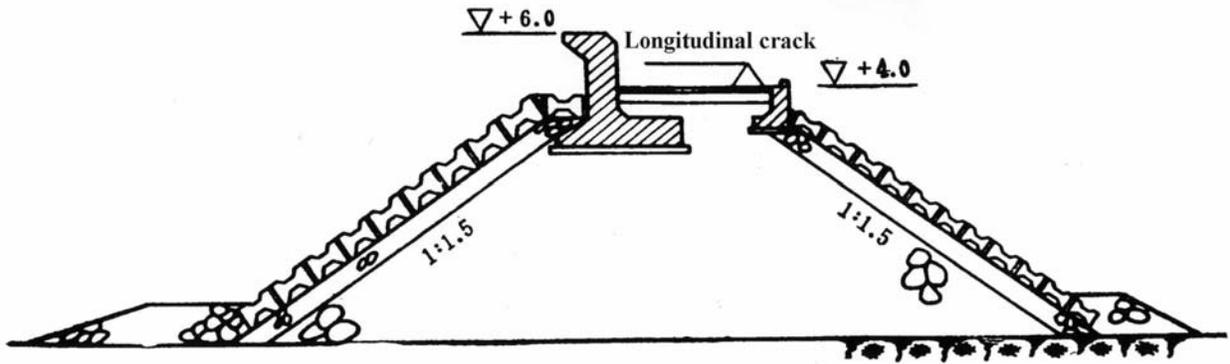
A sketch of the pavement structure of the mound approach dike and position of the cracks. The first stage project of the Crude Oil Pier.
